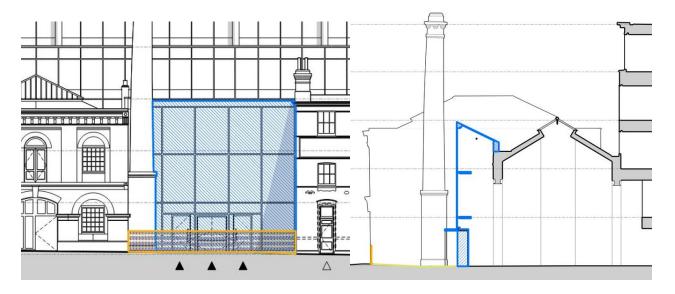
Extent of structures removed adjoining listed building at 34b York Way (Elevation and Section)
